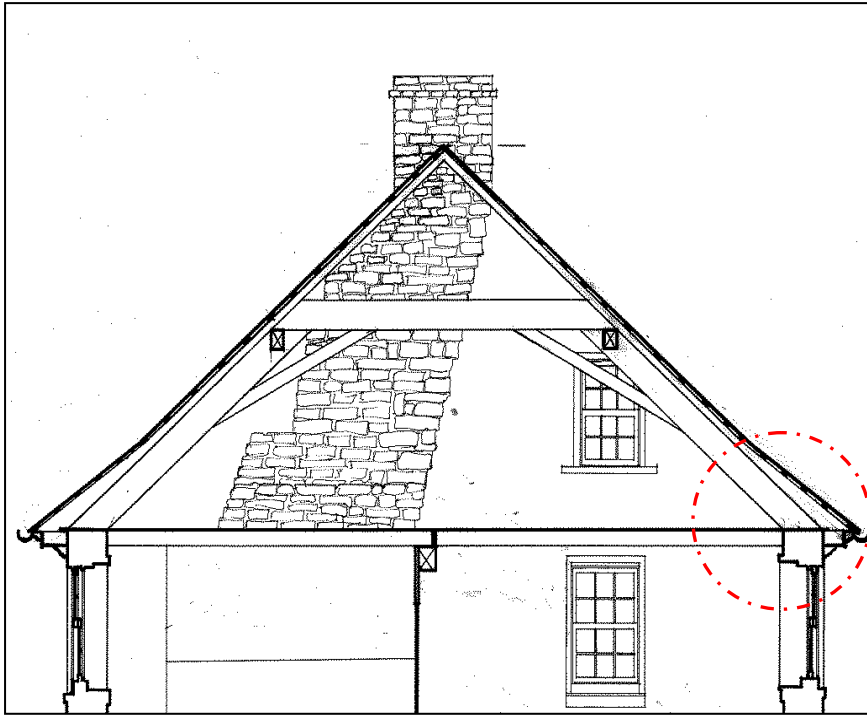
Section of Fort Bowman showing the roof kick (circled) as well as the truss system. (Historic American Building Survey, National Park Service, Art Crook, VA-909)
